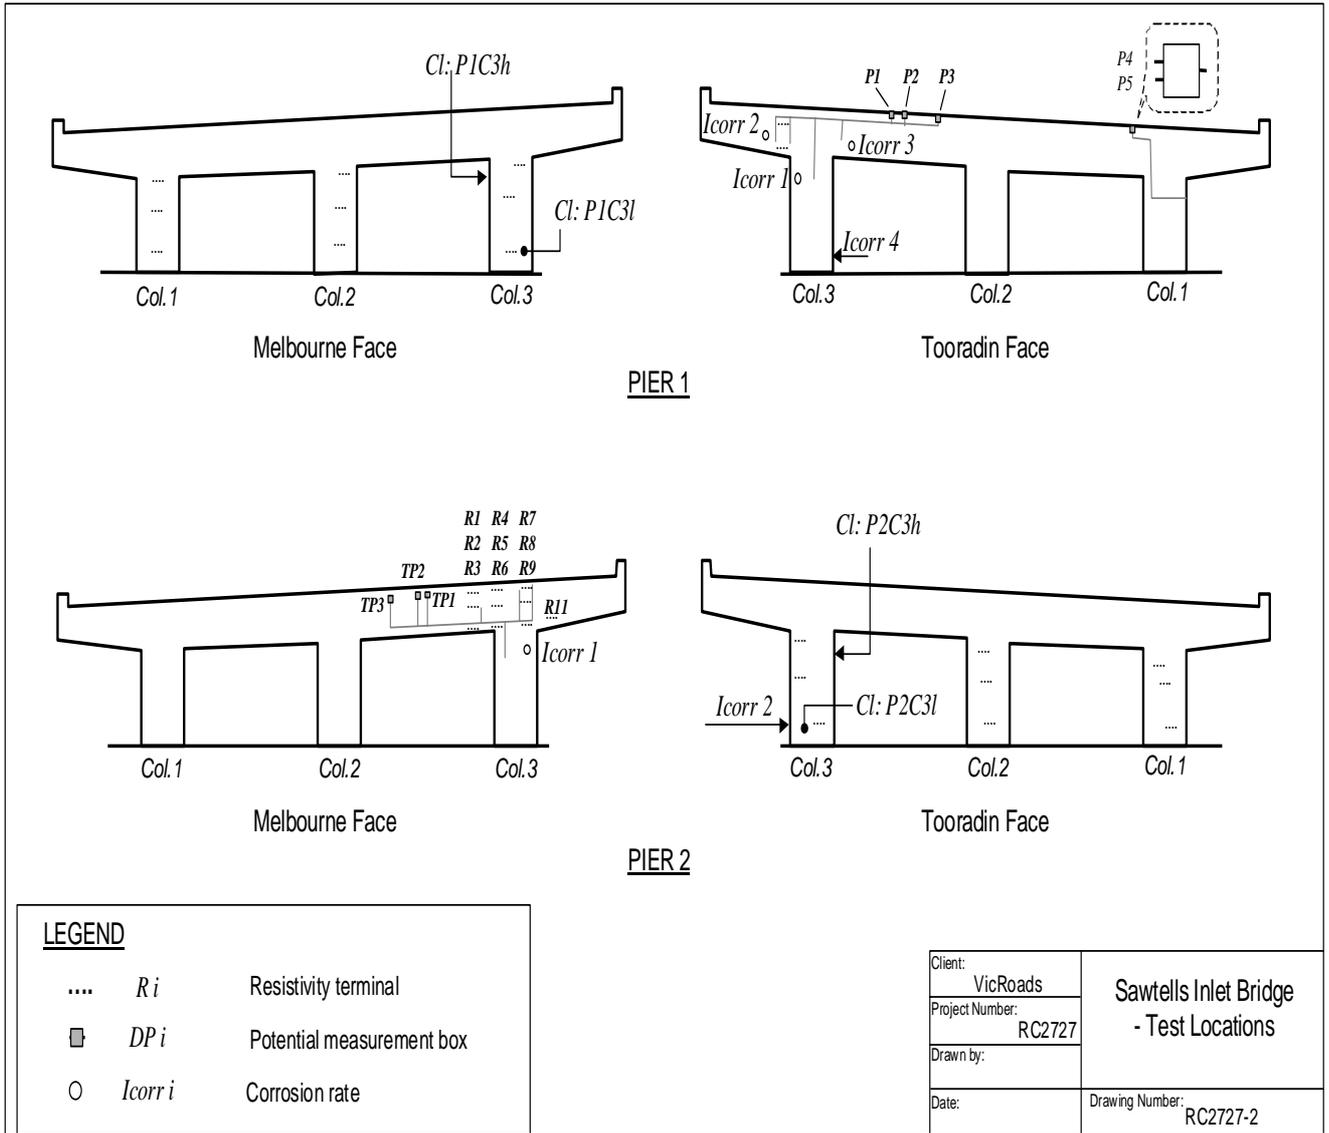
Sawtells Inlet Bridge Test Locations, November 2002
